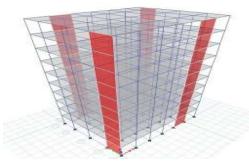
D Modeling of Ten Story Building with 0.5% shear wall ratio
